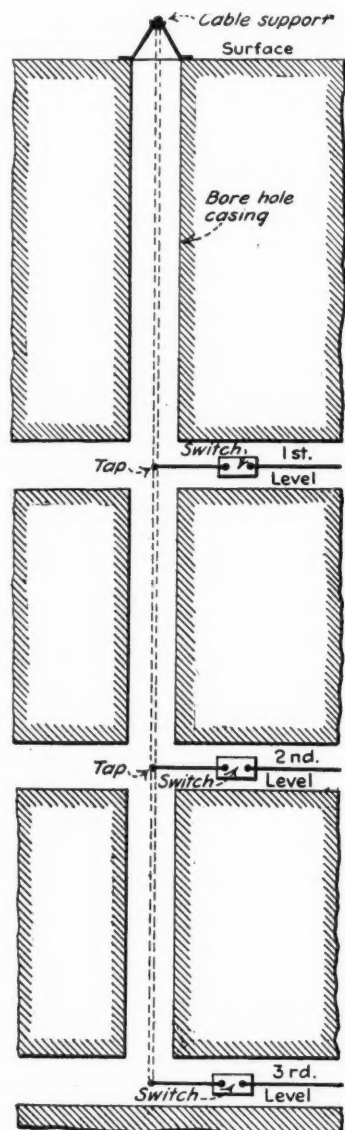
CONTINUOUS CABLE FROM SURFACE TO BOTTOM LEVEL
